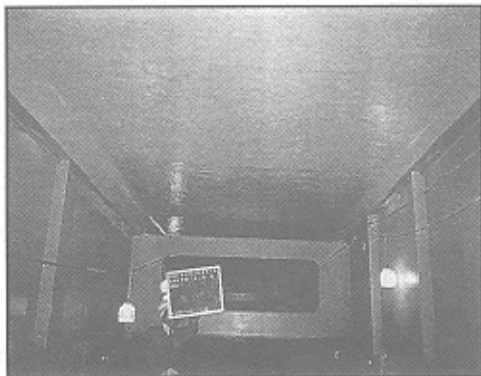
Strengthening of the deck slab of Mitatebashi Bridge in Japan
